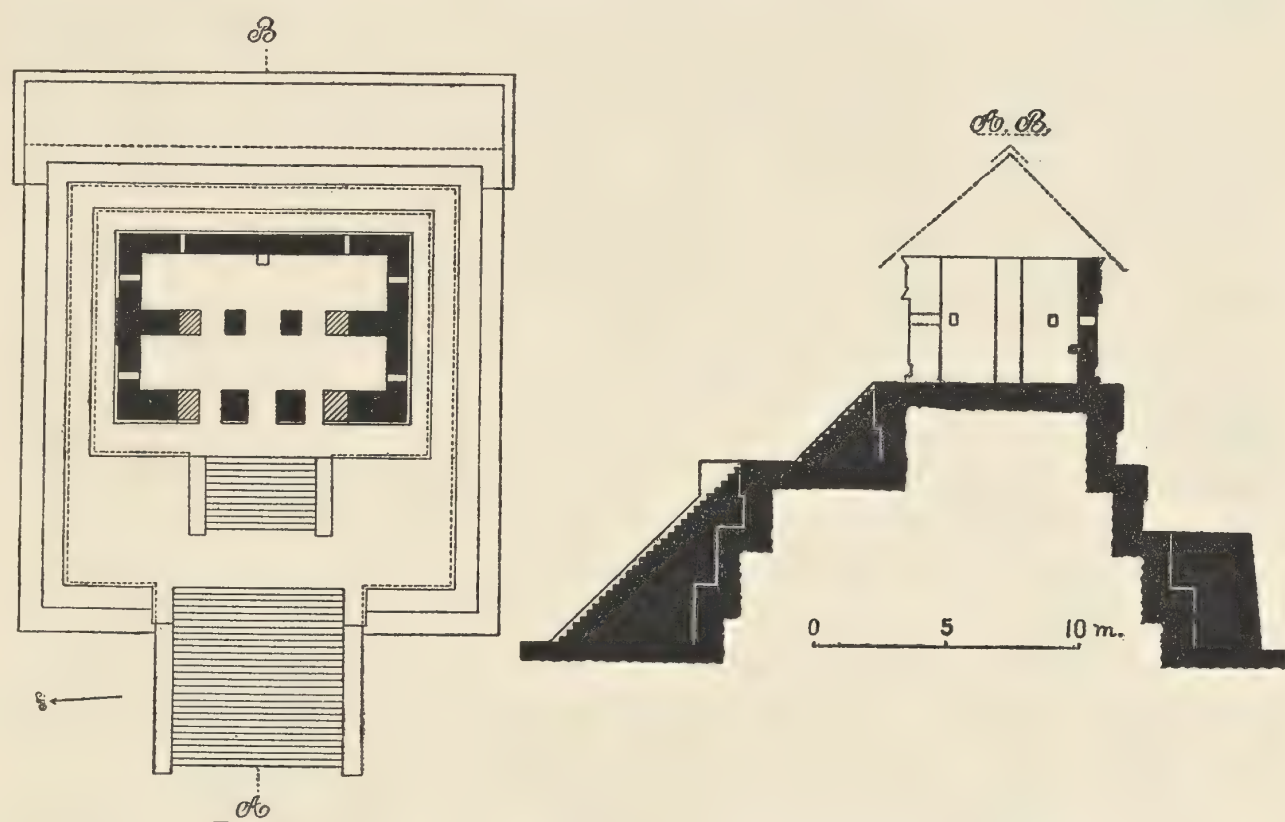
TÓPOXTÉ: GROUND-PLAN AND SECTION OF MAIN TEMPLE.
